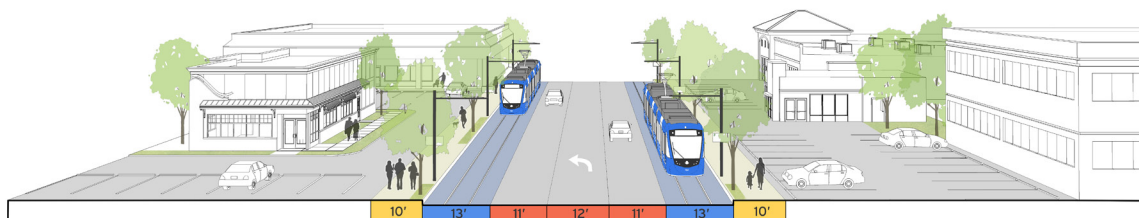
MIXED TRAFFIC STREETCAR WITH LEFT-TURN LANE AND WIDENED TRAFFIC LANES SOUTH OF LINWOOD TO BRUSH CREEK
